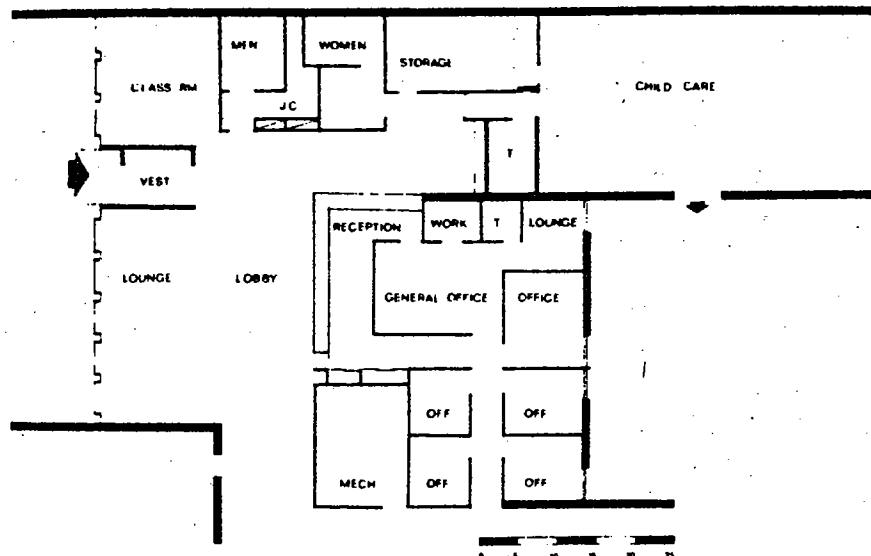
Oldland Branch, YWCA of Metropolitan Detroit, Michigan. Entrance area, offices, child care. Branch building: (O'Dell, Hewlett & Lackenbach, Architects.)
